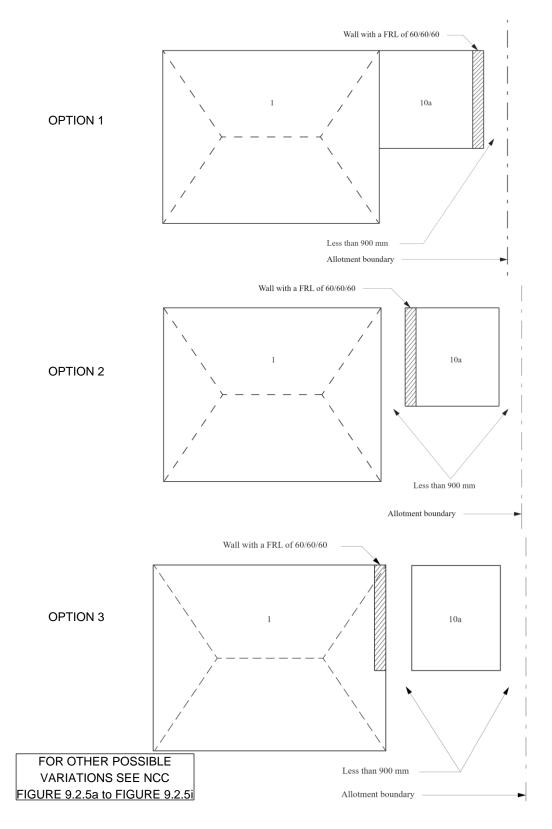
Fire rated wall (FRL 60/60/60) required where a Class 10a structure is located between a Class 1 building and an allotment boundary (that is not a boundary with a road or other public space) and positioned within 900 mm of the allotment boundary (adapted from NCC Figures 9.2.5a to FIGURE 9.2.5i).
